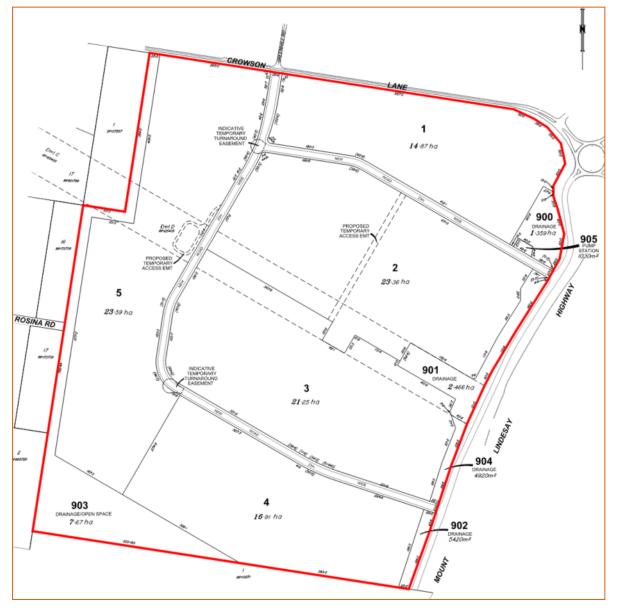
Proposed Amended ROL Layout (Source: Wolters, August 2023)
